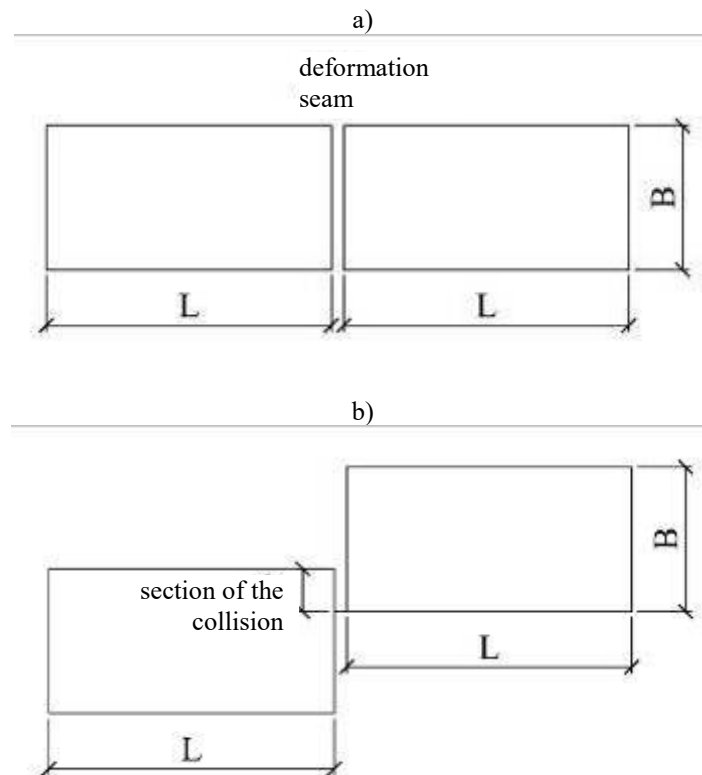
Blocking circuit in terms of residential buildings block-sections:
